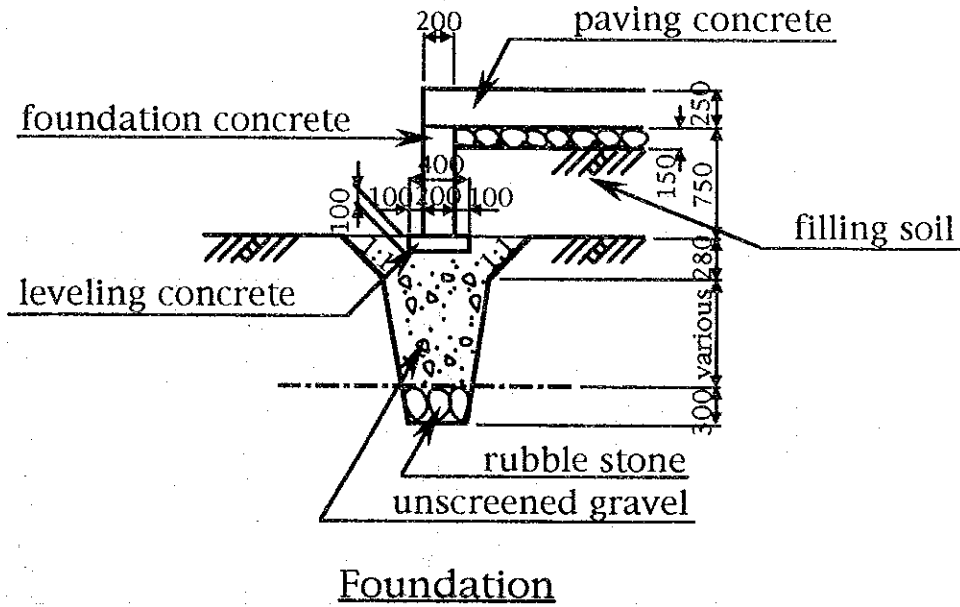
Foundation and Concrete Pavement for Container Platform
